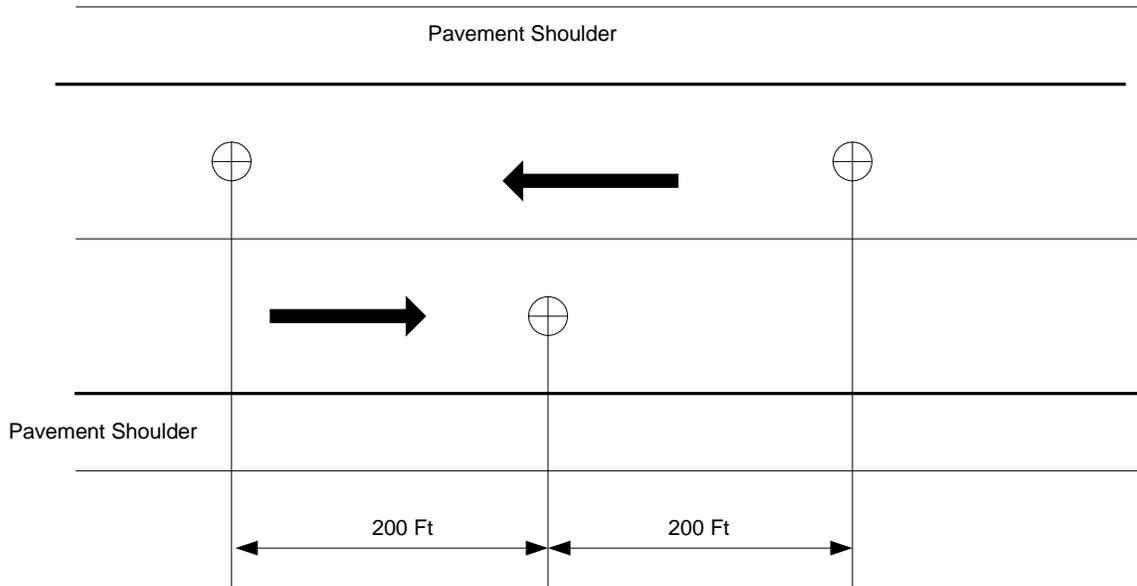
EXPLORATION LAYOUT FOR A TWO LANE ROAD OR SINGLE LANE RAMP
